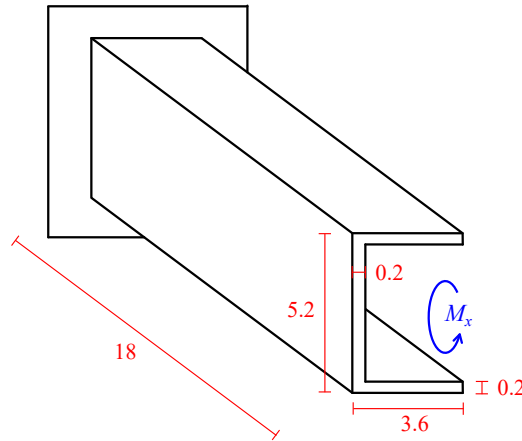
C-shaped cantilever: static scheme and specimen geometry (all dimensions in meters)
